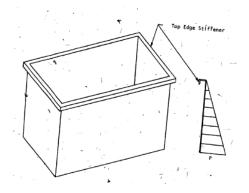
Tank with Top-Edge Stiffener (BS., 2000).
